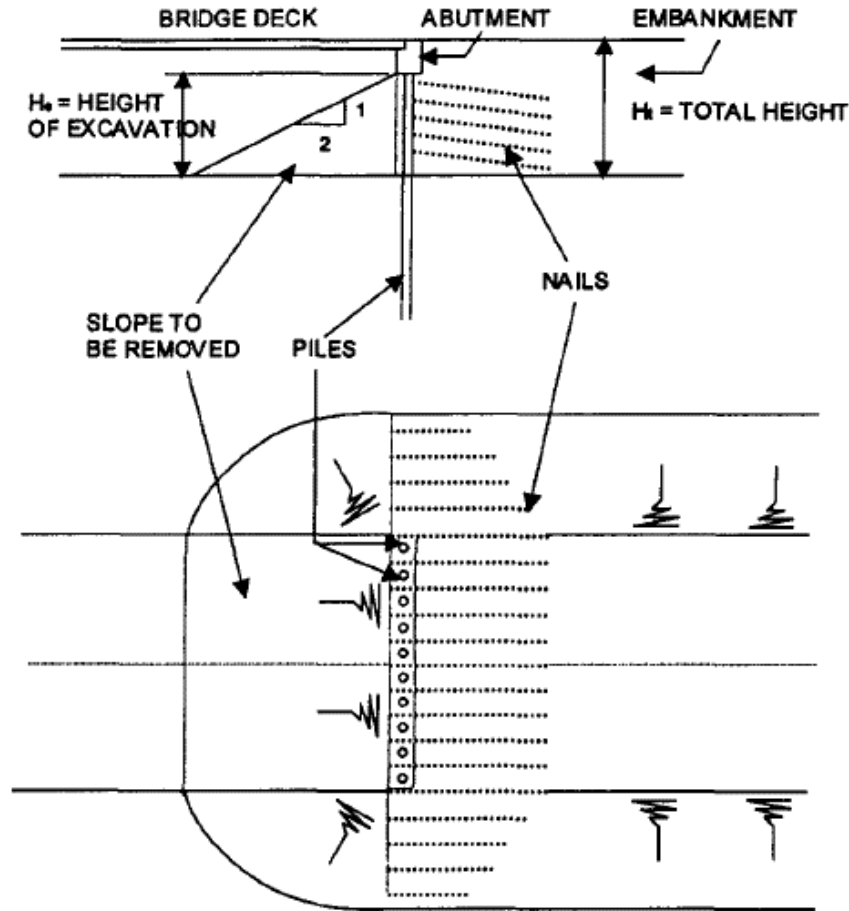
Soil-Nailed Wall under Polled Bridge Abutment (after Briaud and Lim, 1997).
